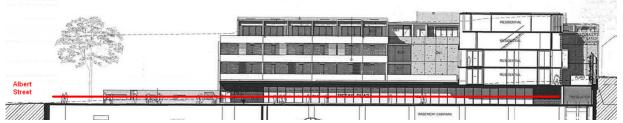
South-facing section through DA2010/1446 showing the excavated public plaza and direct sightline from Albert Street (indicated by the red line)
